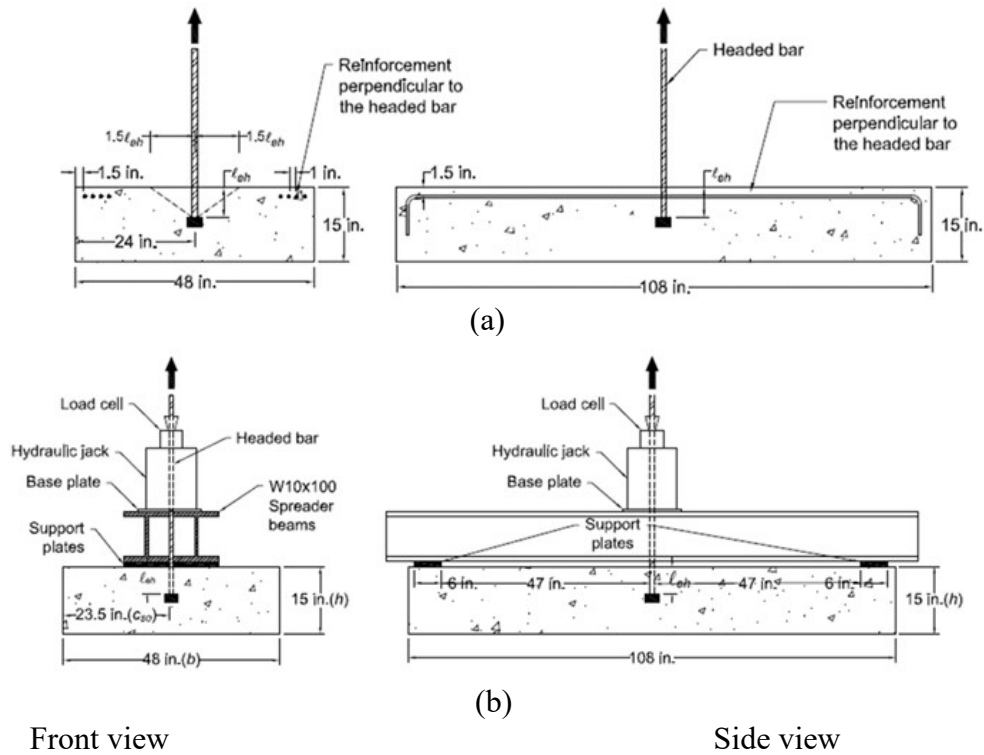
(a) Details of the specimen with one headed bar embedded at center of slab
